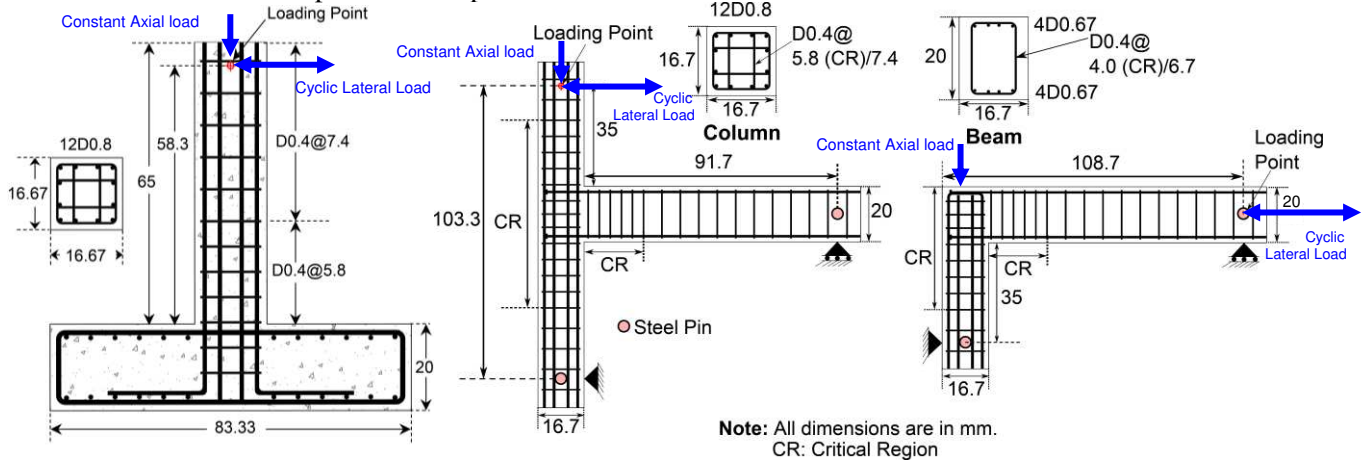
Specimen details: (left) Column, (middle) Exterior beam-column joint, and (right) Knee beam-column joint.
